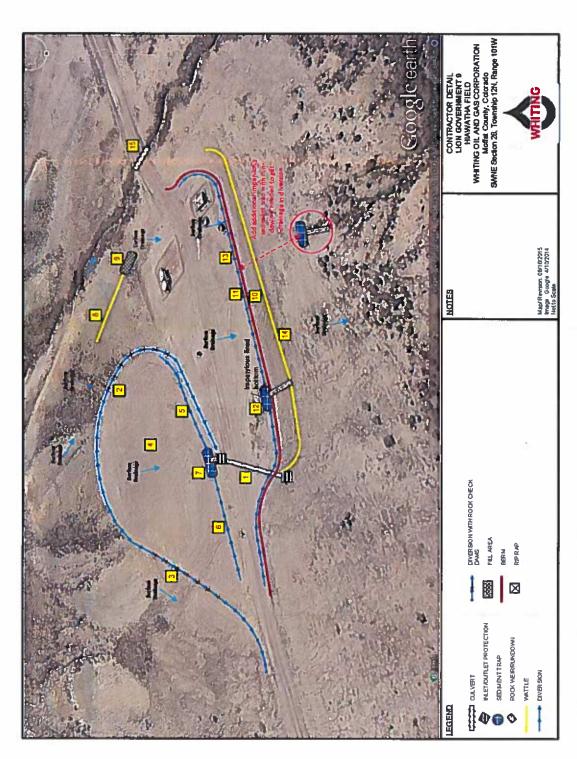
Diagram depicting stormwater features proposed for construction on Lion Government 9.
